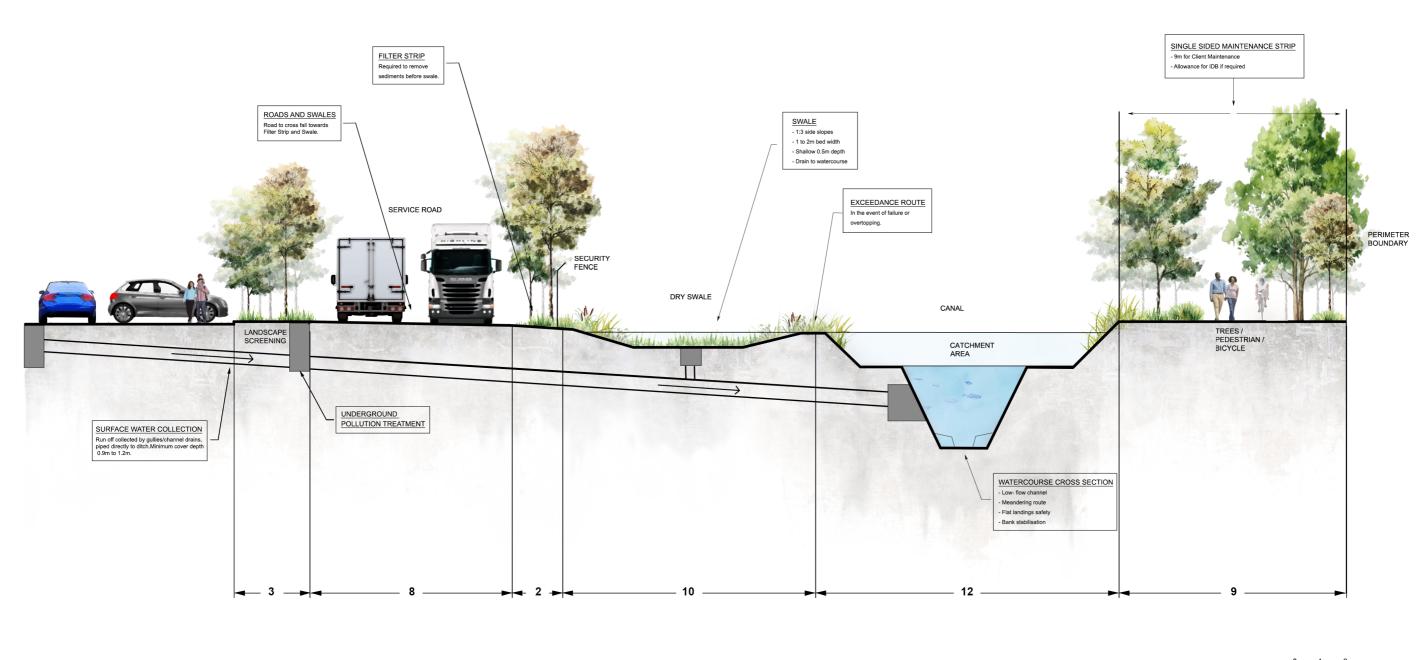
Indicative cross section showing car park screening, internal service road, security fencing, stormwater drainage swale, open watercourse and perimeter landscaping (not to scale)
